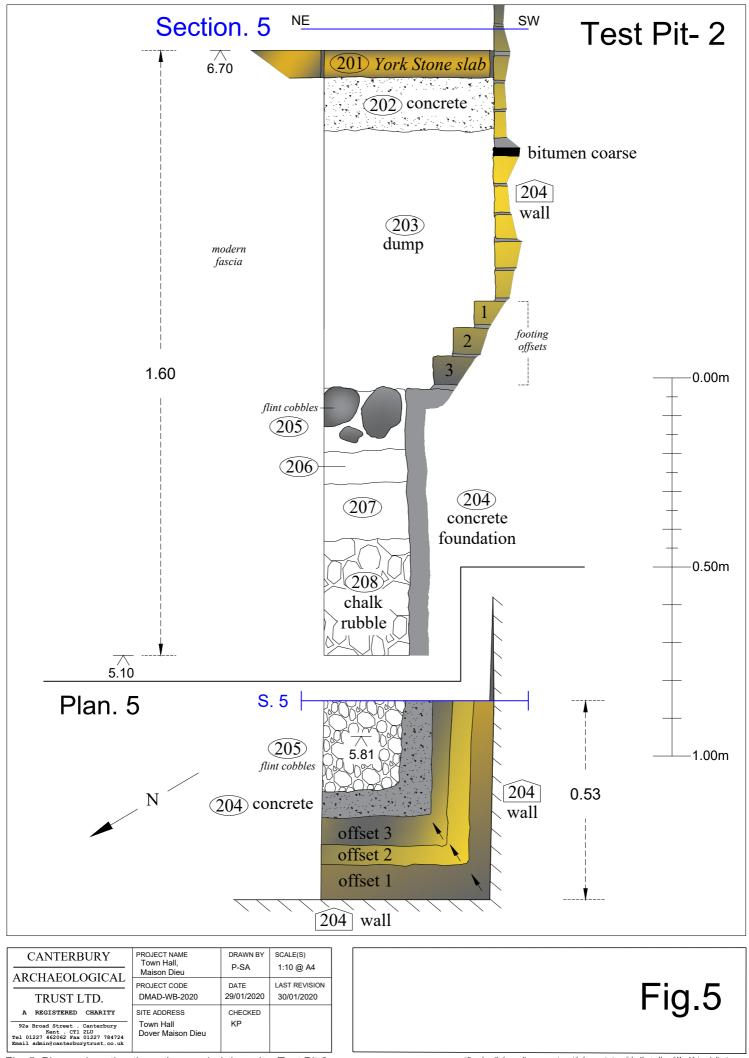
Plan and section through recorded deposits, Test Pit 2
